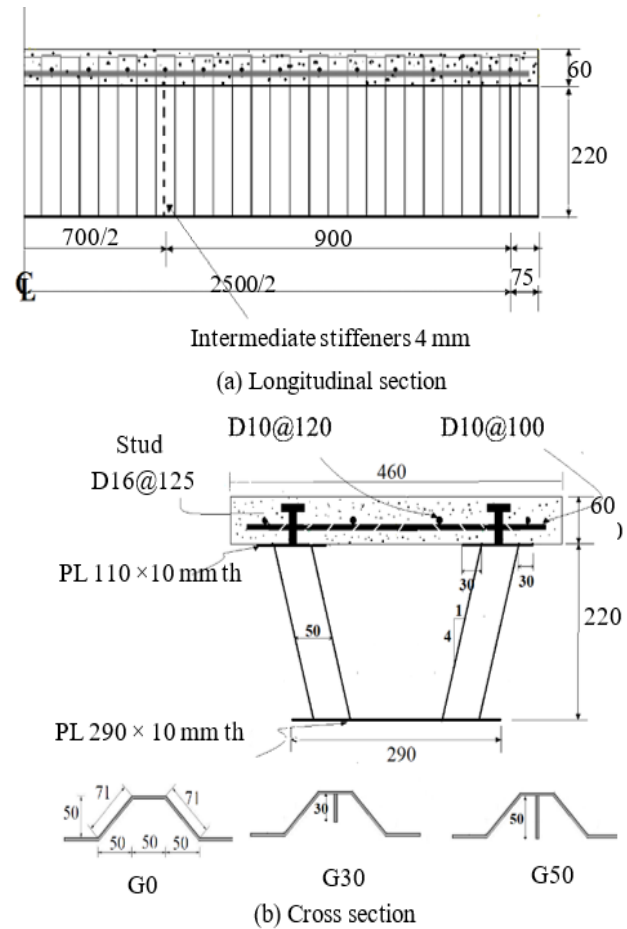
Nominal geometry of cross - section (all dimensions are in mm)
